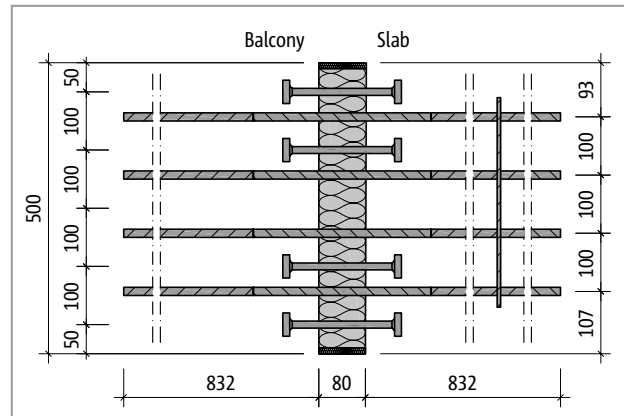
Schöck Isokorb® T type Q-P-V10: Product layout
